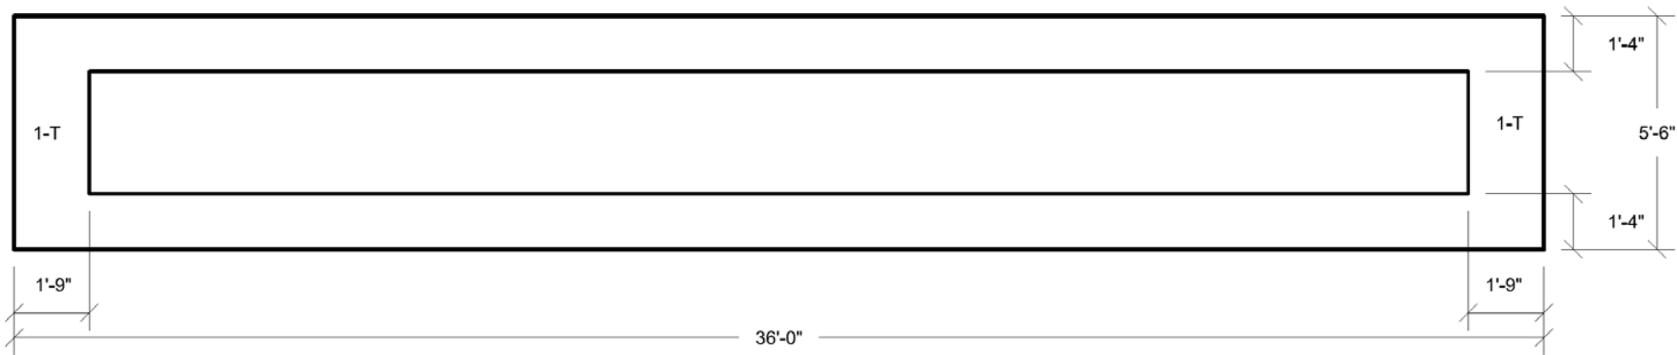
H.7-19A Roof of Tunnel Looking Down Transverse Reinforcement Zones
